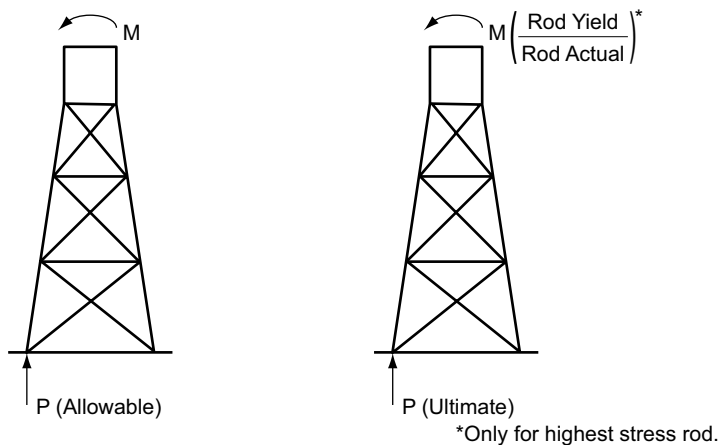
Diagram for checking foundation stability of cross-braced, column-supported elevated tanks
